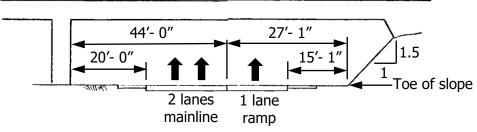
Bridge elevation view of horizontal clearances for a highway feature below the bridge carrying mainline and ramp.
